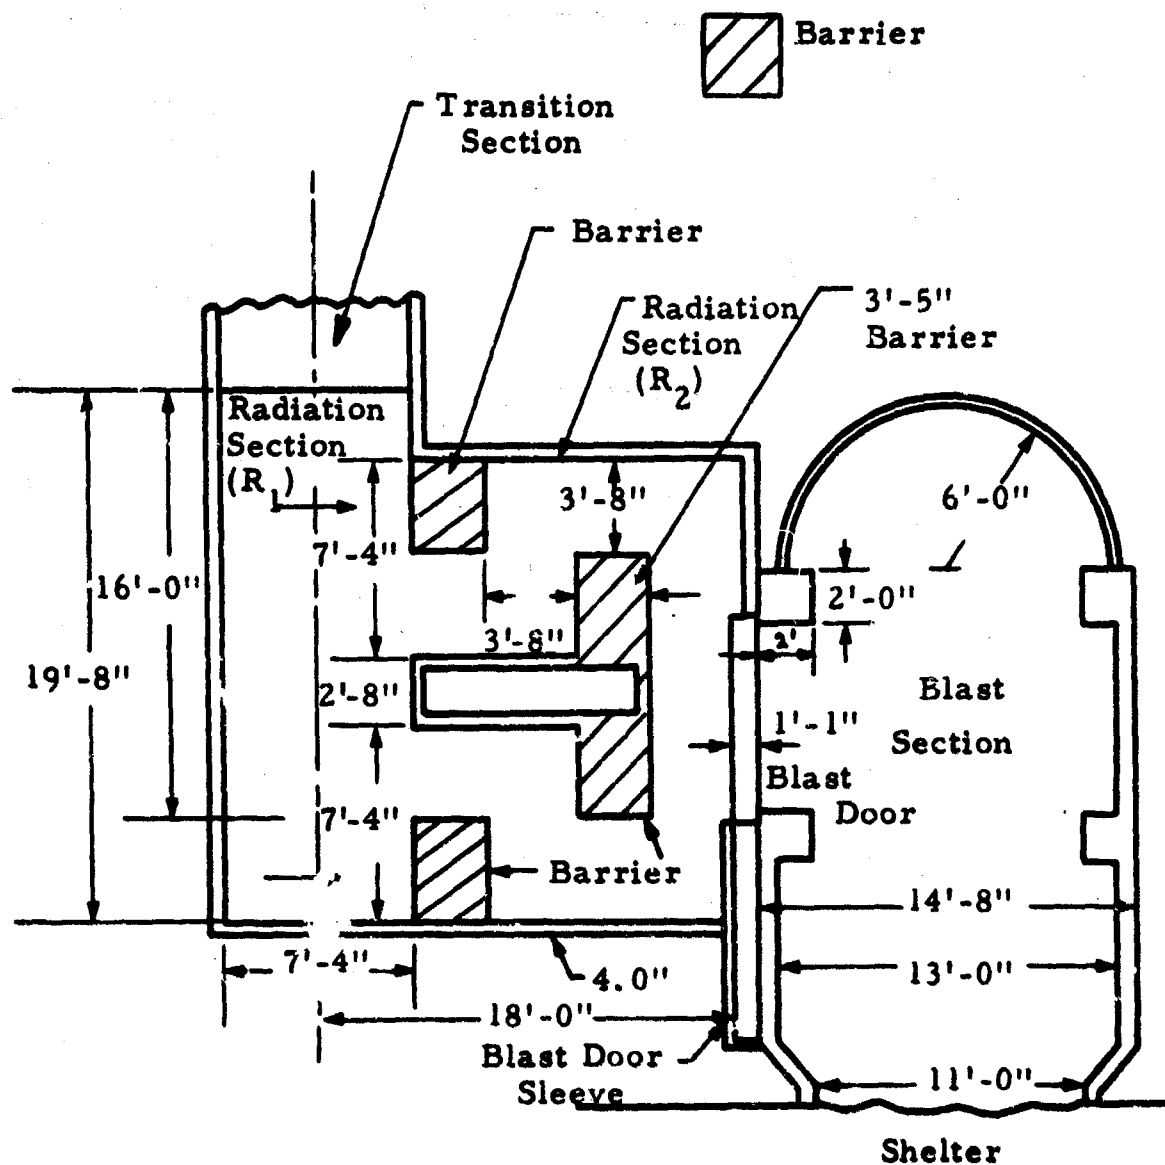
PLAN VIEW OF REVISED ENTRANCEWAY LAYOUT, NONBLAST-RESISTANT CUBICLE AND CYLINDER
